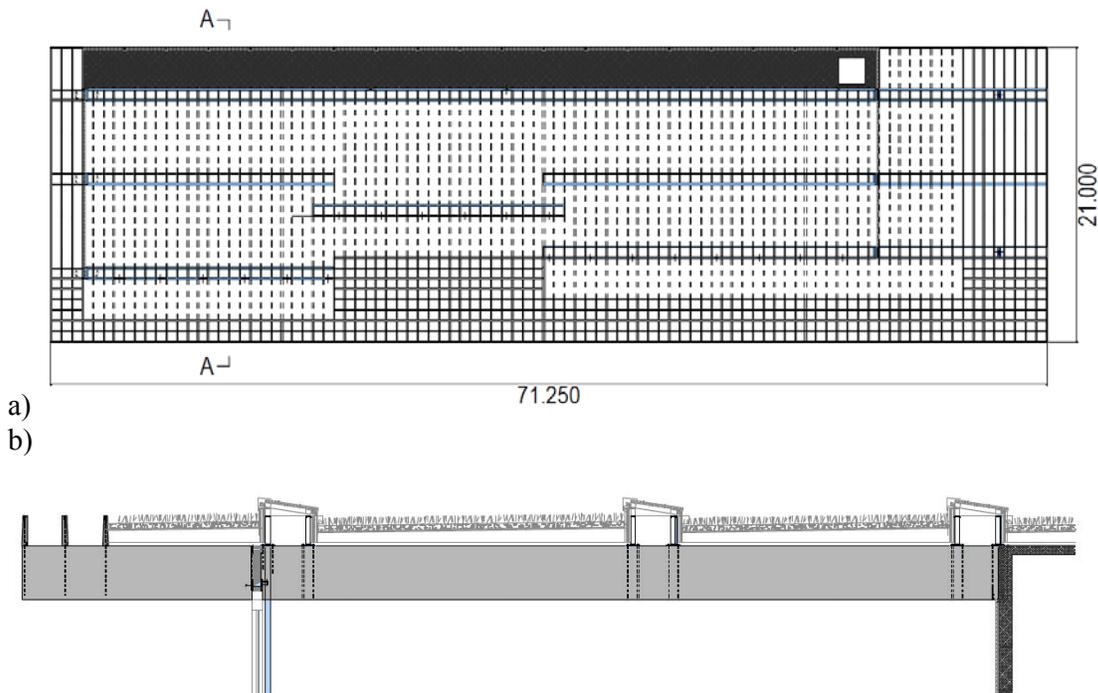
a) plan view and b) view of a transverse beam with a span of 13.50 m and a cantilever of 4.50 m (cross section A-A in plan view)
